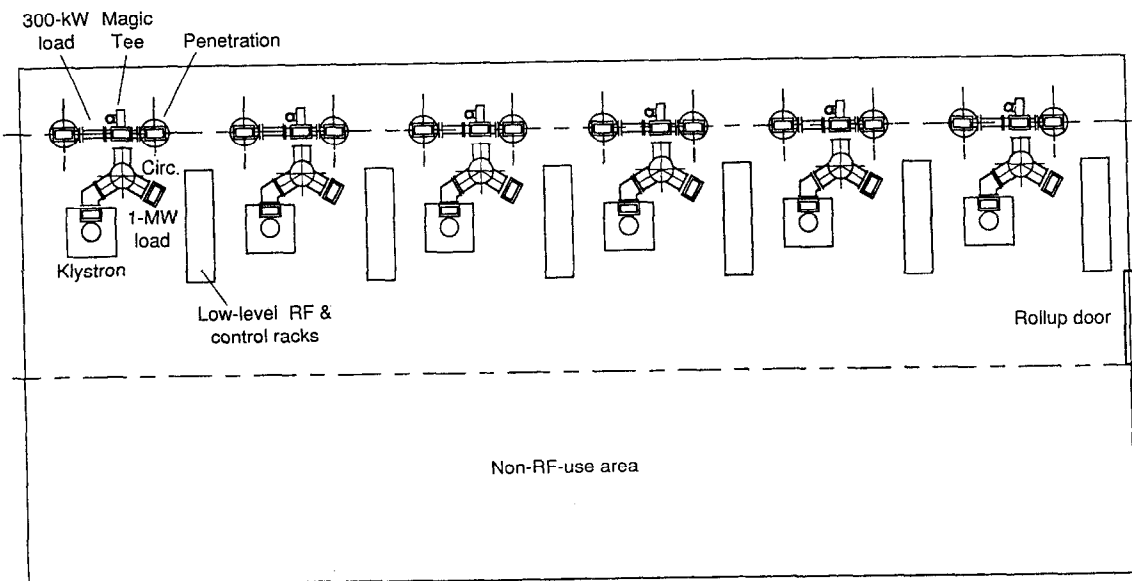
Plan view of an existing RF building, showing the arrangement of six RF stations.
